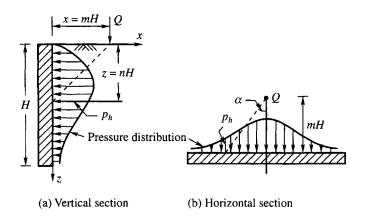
Lateral pressure against a rigid wall due to a point load
